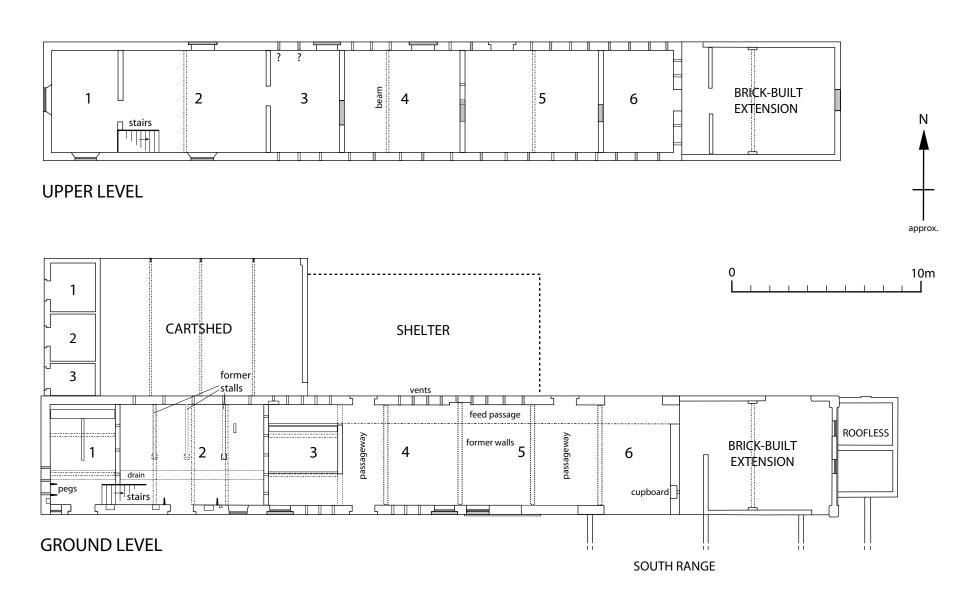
Plans of the existing ground and upper floor levels of the mainly stone-built central range (Units 2/3) at Pastures Farm, Long Lane, Kirk Langley., Derbyshire. Rooms are numbered and blocked features are shown with tone. Based on architect's plans. Scale 1:200.
